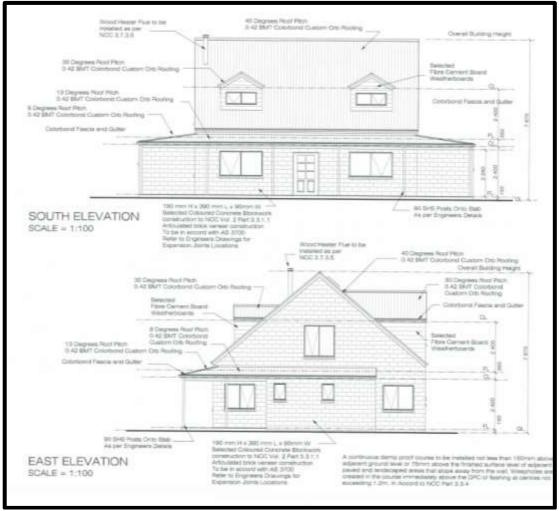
south and east elevations of proposed dwelling (Nicholas Fitsialos, 2017)
